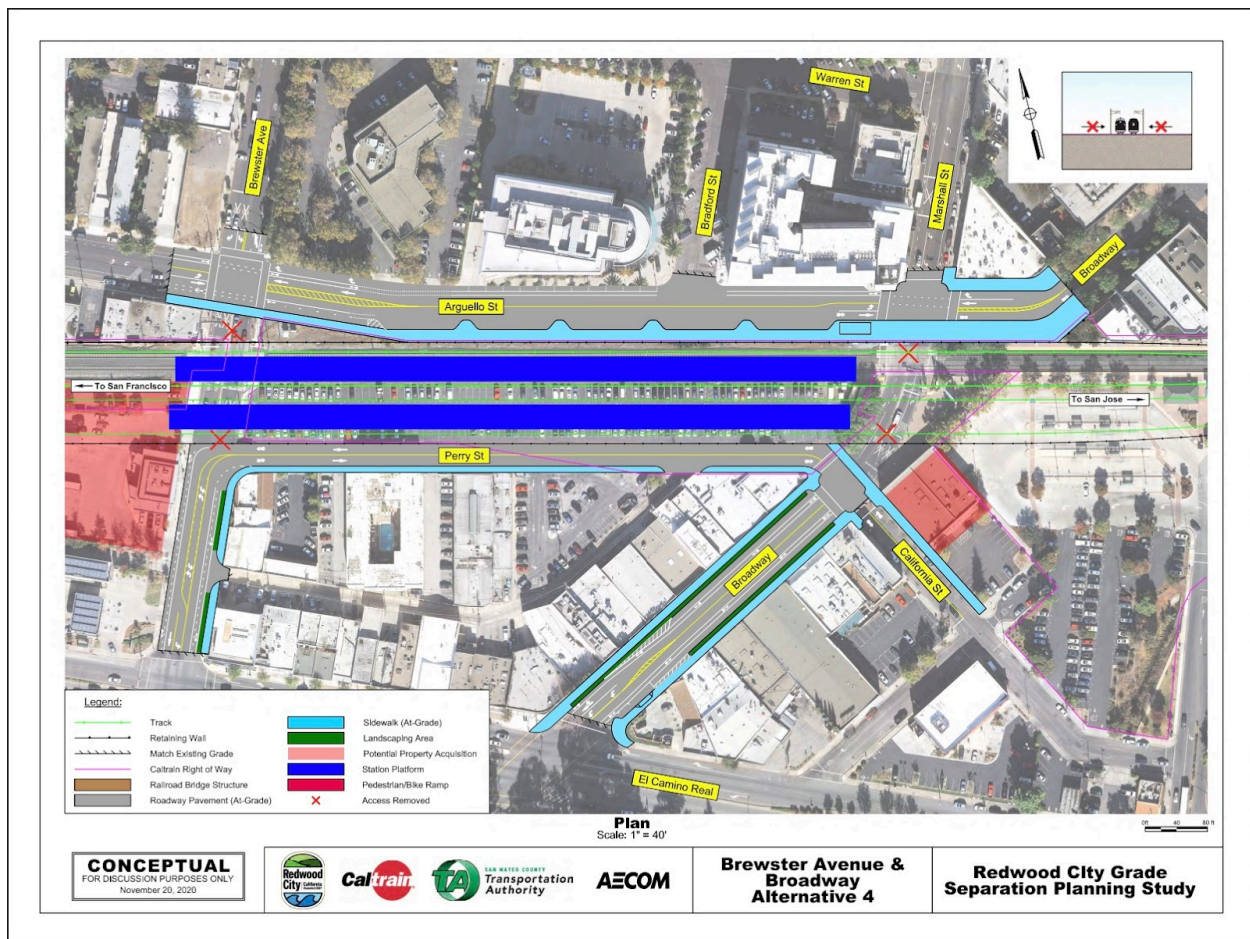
Visual depiction of modifications to Broadway and Brewster Avenues for design alternative 4 (Redwood City, 2020).
